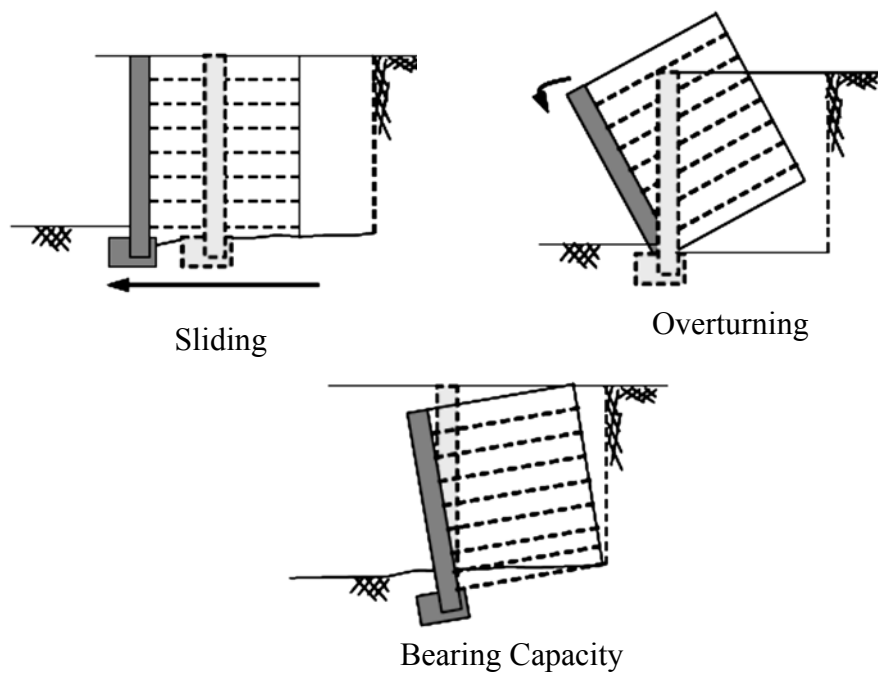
Potential External Failure Modes for MSE Walls (after (FHWA 2009)).
